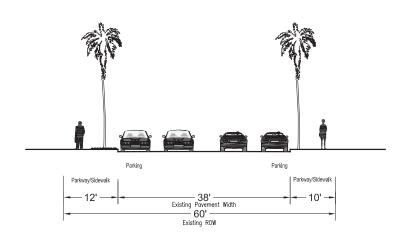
TYPICAL SECTION - PALM AVENUE
